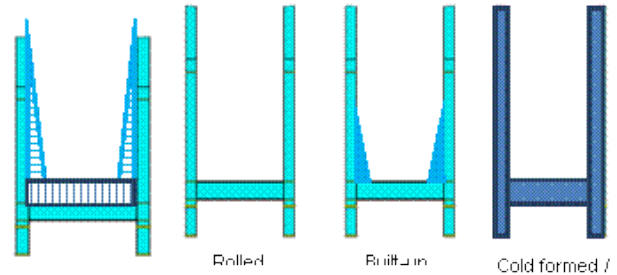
Typical tank frames with hydro static loading and different structural sections of study
